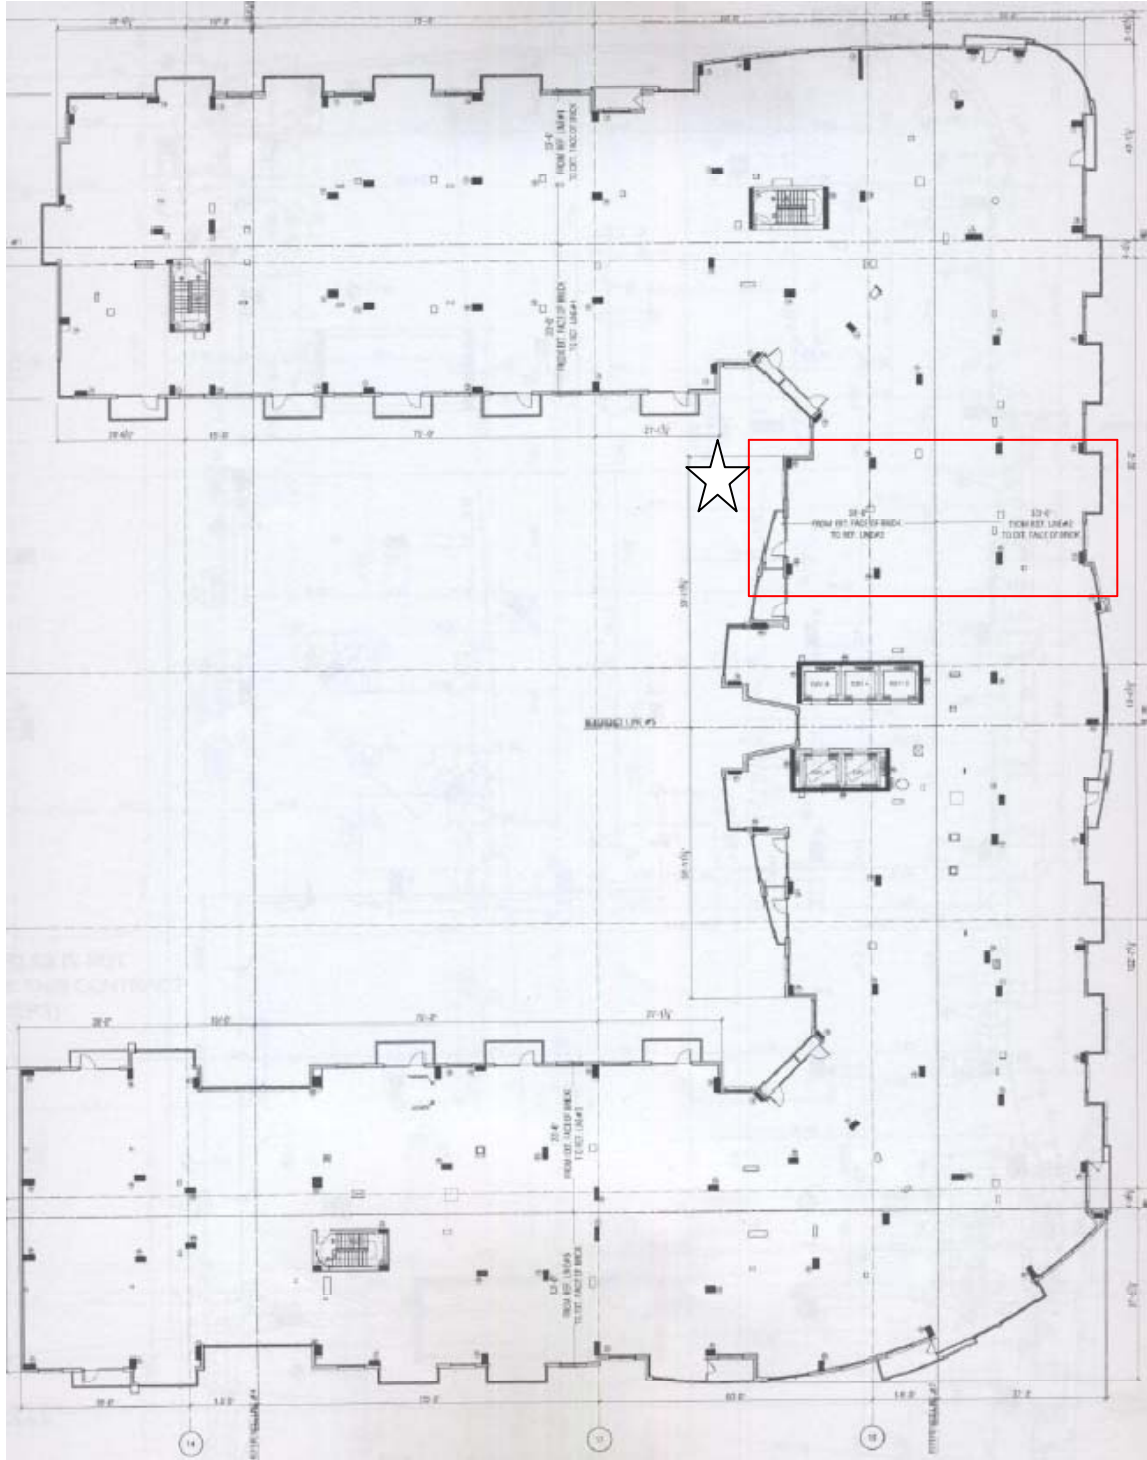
(The rectangular area marked with a “☆” is the typical frame used to design the alternative floor systems throughout this report and is blown up in Figure: 1
